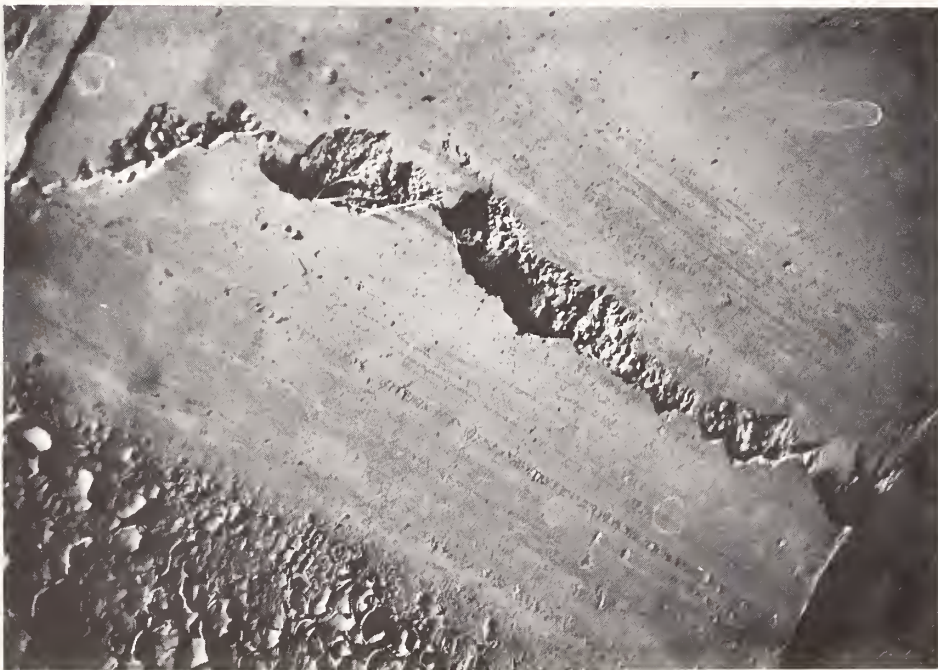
CRACK ON FLOOR OF CULVERT NO. 53
